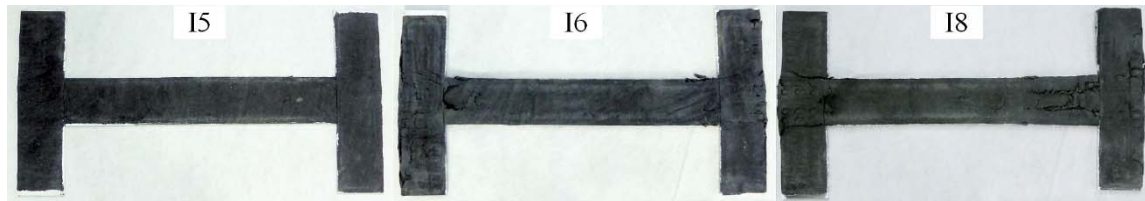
Wallettes from the second series: soft layer degradation after testing [57]
